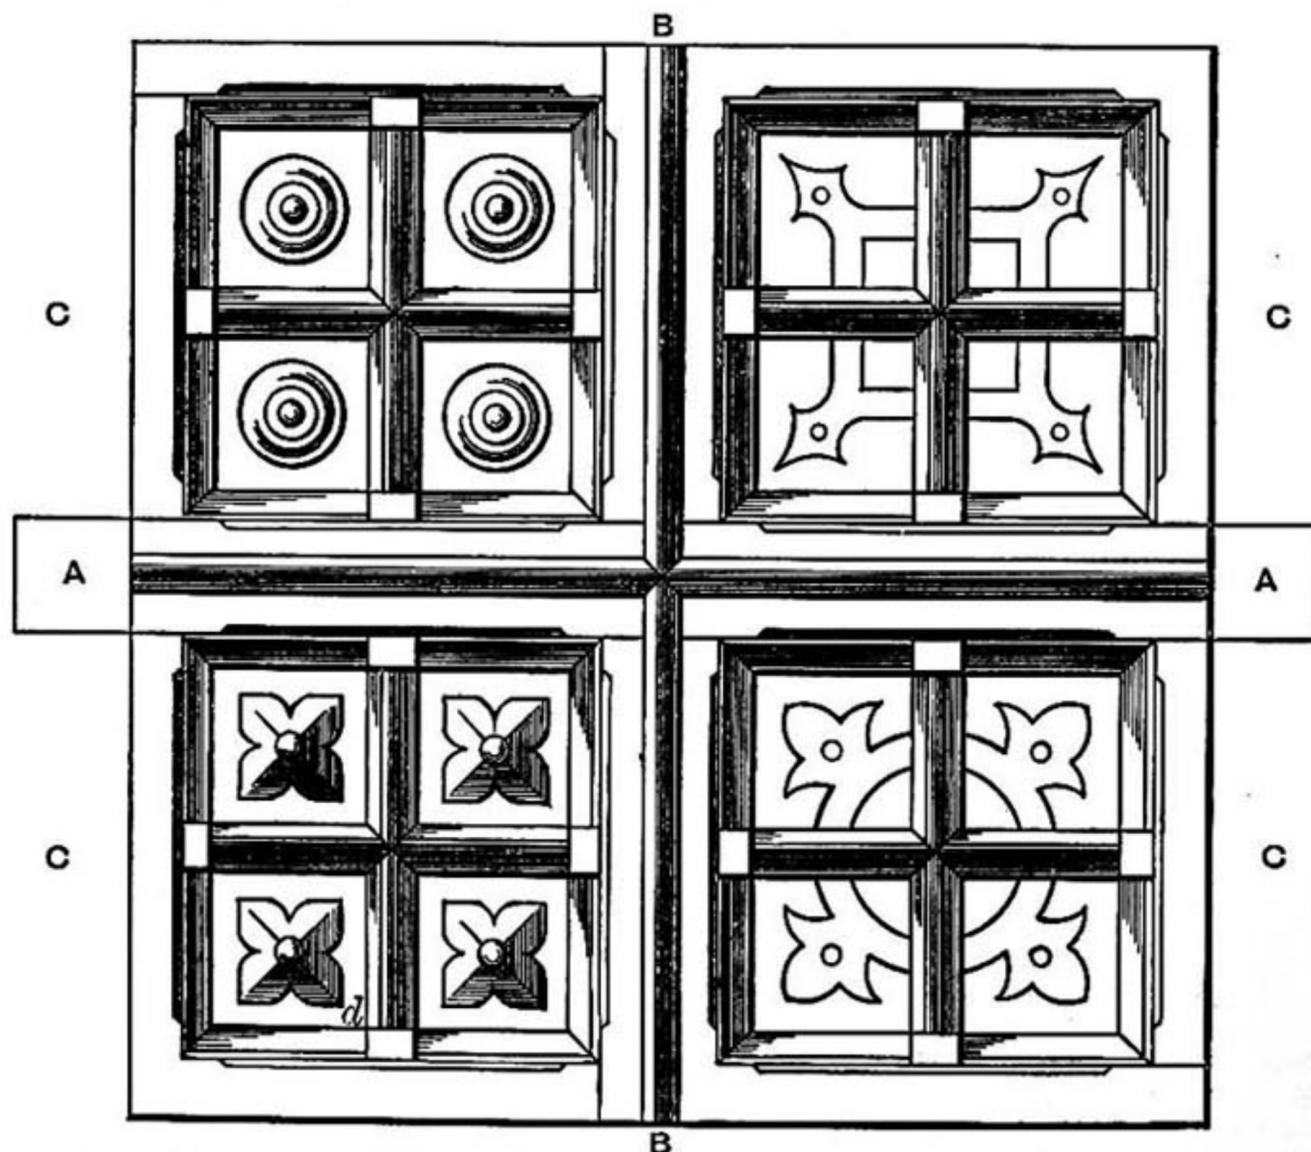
Wood Ceiling of Hall, with Four Alternative Designs for Panels.
